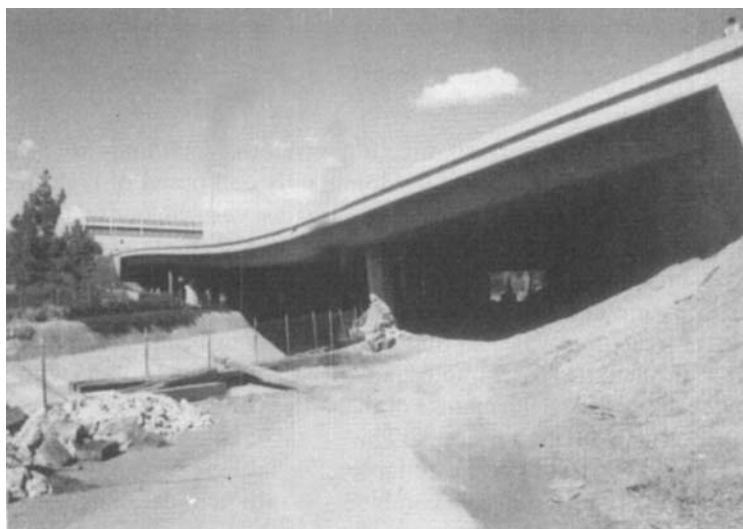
Bull Creek Canyon Channel Bridge. Significant vertical deformations can be observed at mid-span. Photograph courtesy of National Center for Earthquake Engineering Research
